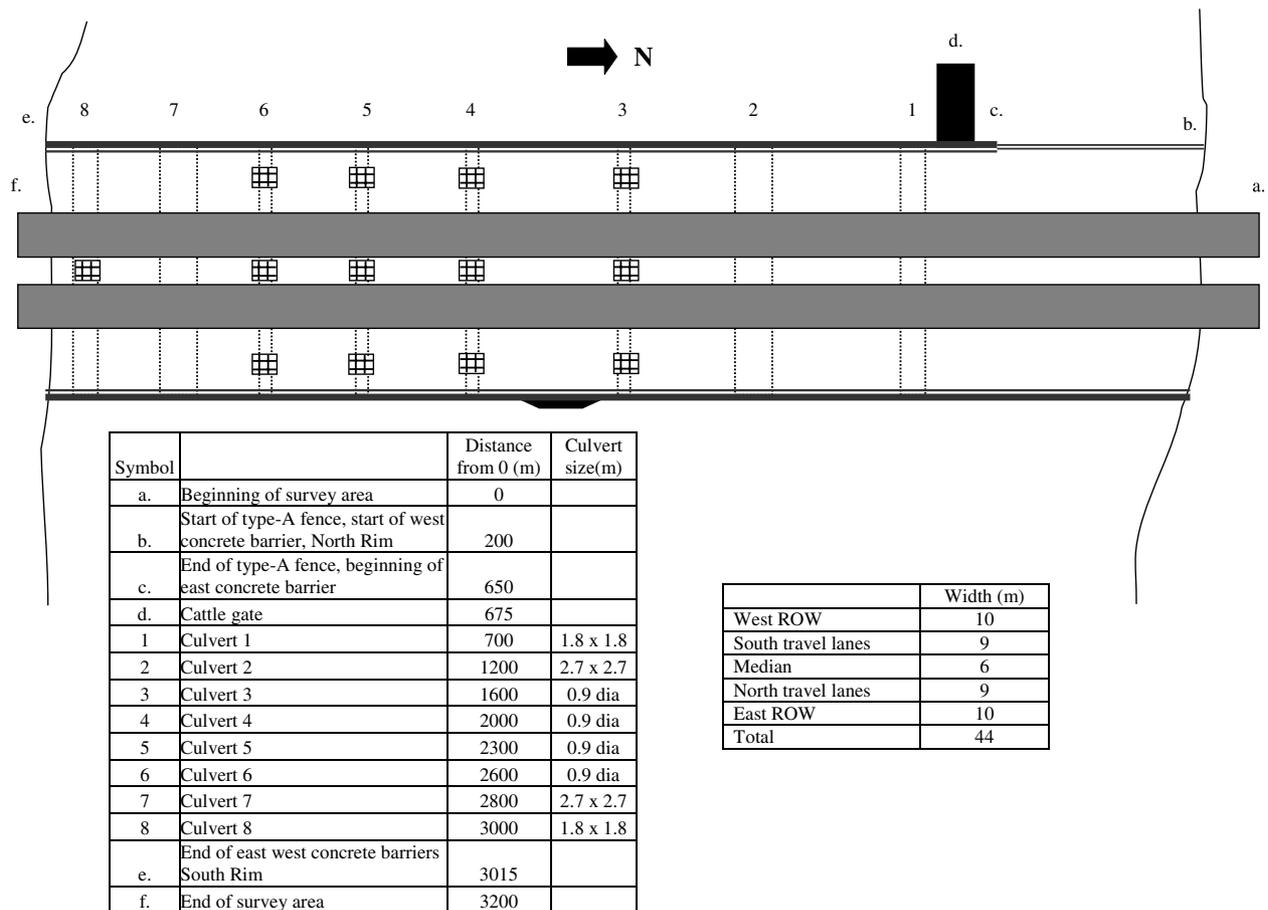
Schematic representation of US Highway 441 across Paynes Prairie State Preserve. The road is bordered by a prefabricated concrete barrier wall and underlain by 8 culverts. Light boxes (squares) occur across the road only in the new small culverts (g, h, i, j) to allow light; a small grate is in culvert 1. An access road enters on the southbound lane near the northern prairie rim (d), and a visitor turn out is located between culverts g and h. A type-A fence borders private property along the southbound lanes on the north prairie rim (b to c).
